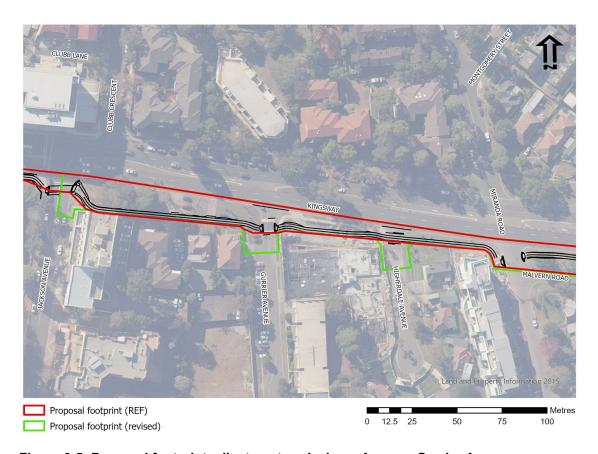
Proposal footprint adjustments – Jackson Avenue, Gurrier Avenue, Higherdale Avenue and Miranda Road
